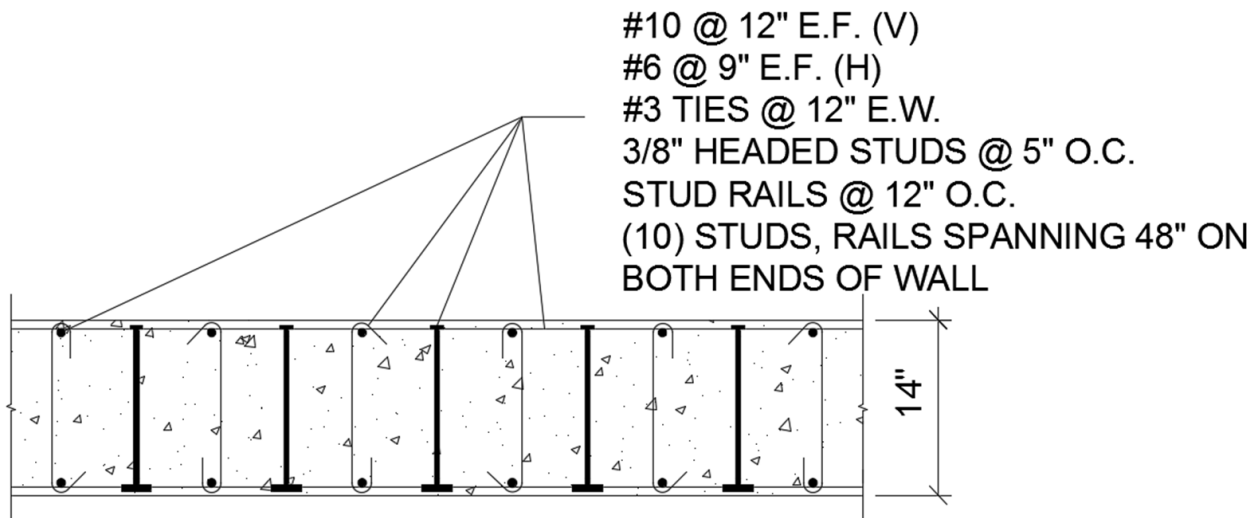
New exterior wall, cross-section at the ground floor level based on tsunami design requirements.
